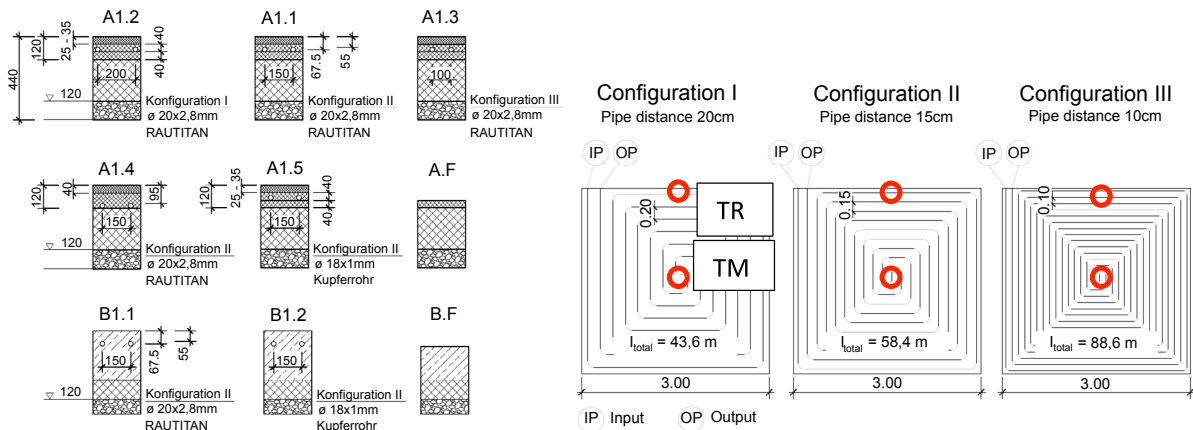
Arrangement of the open space heating systems made of asphalt (yellow) and concrete (green)
